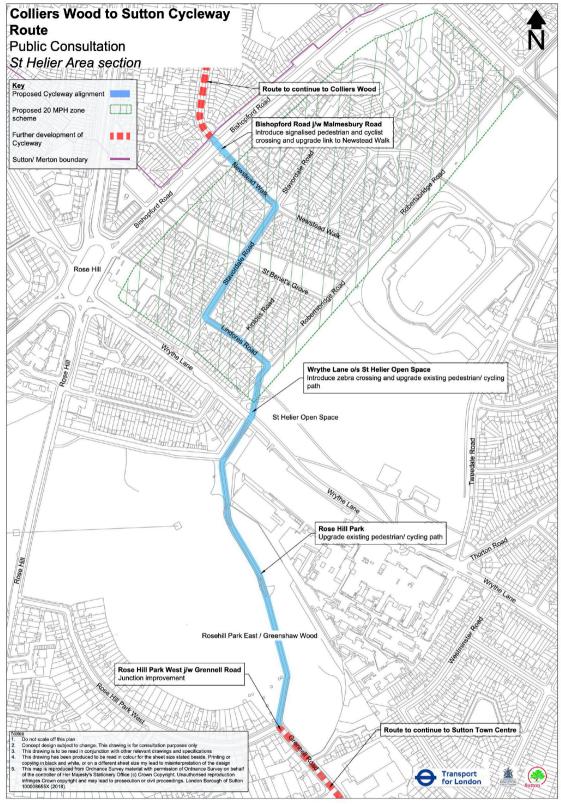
Plan of the Colliers Wood to Sutton Cycleway, St Helier area section (LB of Sutton)
